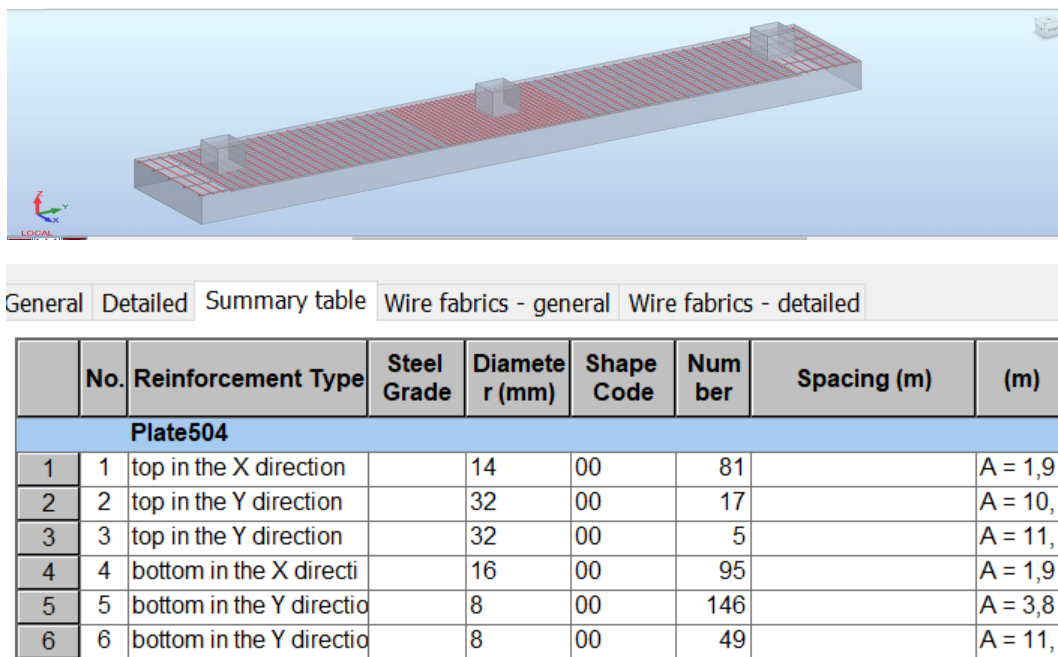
Steel details for top of combined footing column number 37, 39, 41
